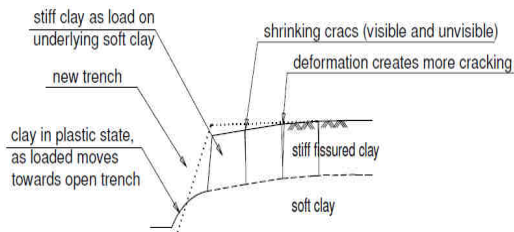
Visual demonstration. Overlying material stiff clay. New cracks due to excavation.
